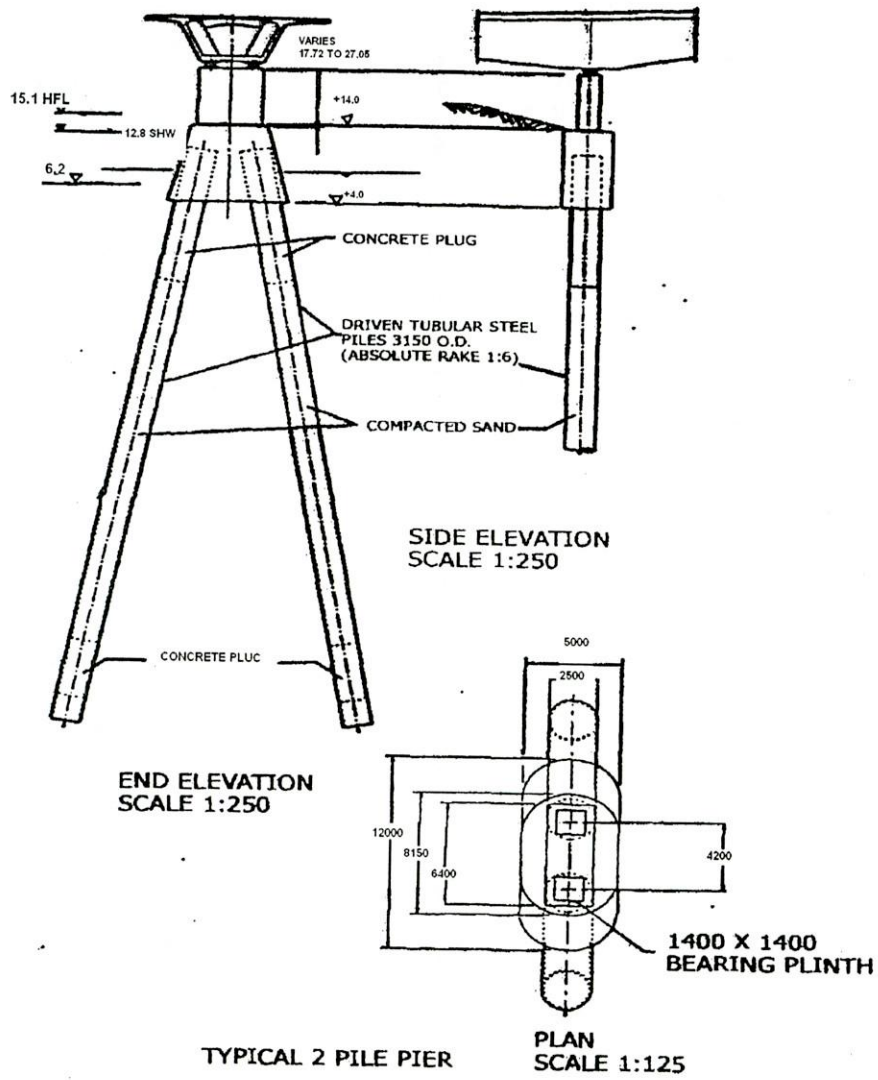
(a) General Arrangement of 2 Piles Pier
